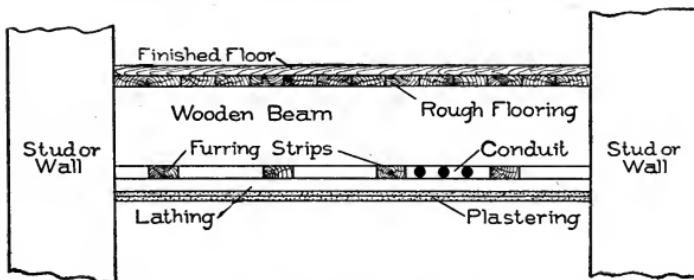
Running Conductors Concealed under Floor in Wooden Frame Building.
